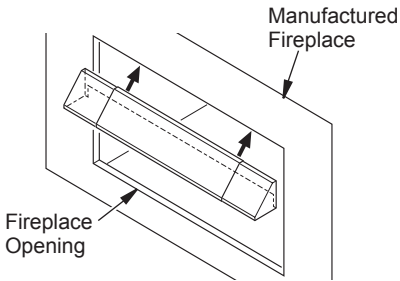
Installing Hood Into Opening of Manufactured Fireplace
